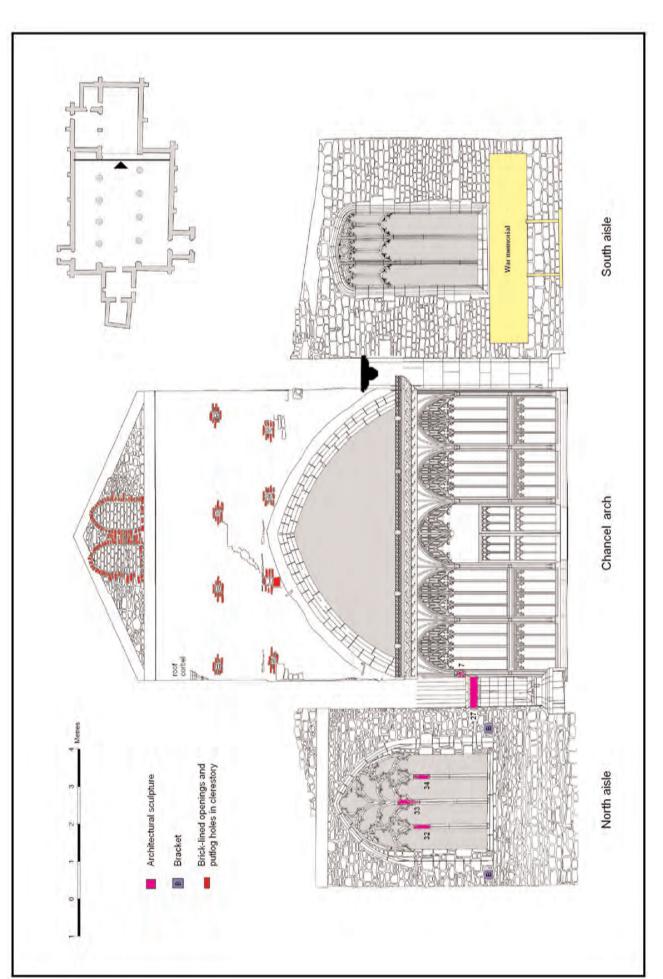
Nave and aisles. Internal sectional elevation, looking east, 1984. Scale 1:100. Drawing: Simon Hayfield
